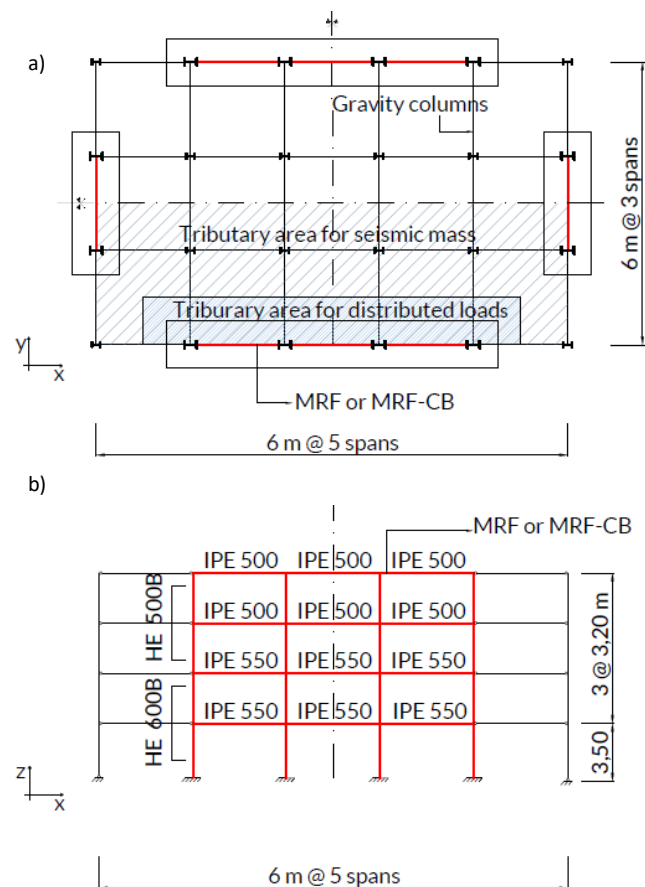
(a) Plan view and (b) Elevation view of the case study building.
